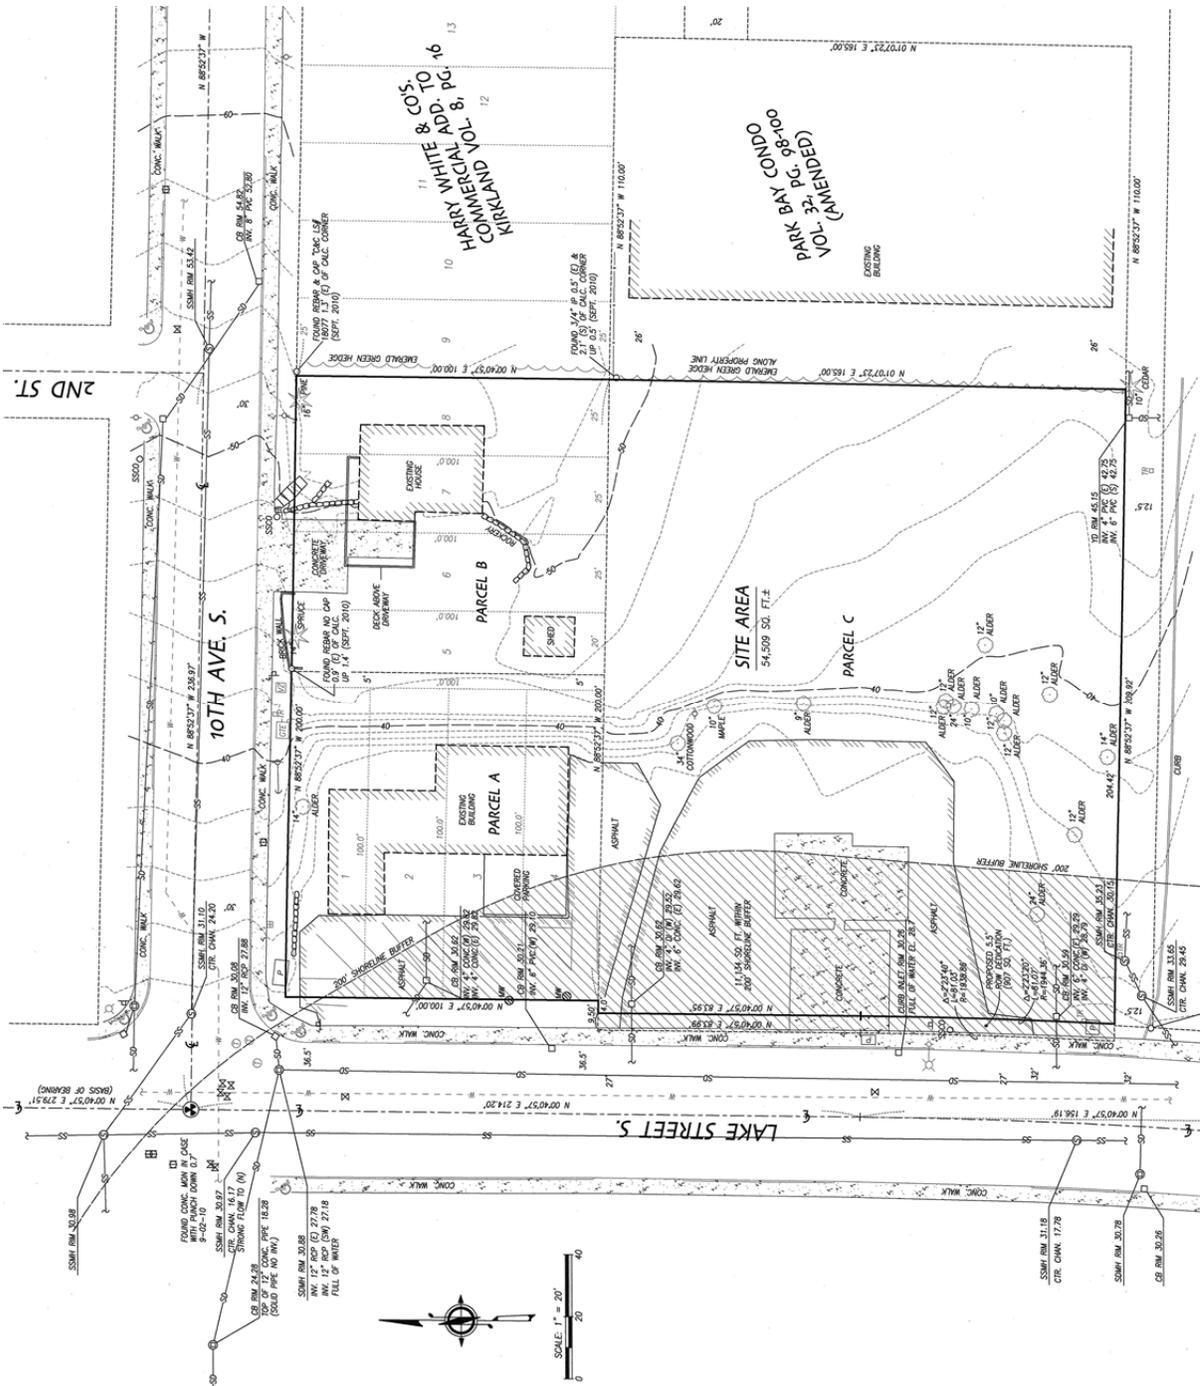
EXISTING FEATURES SITE PLAN
